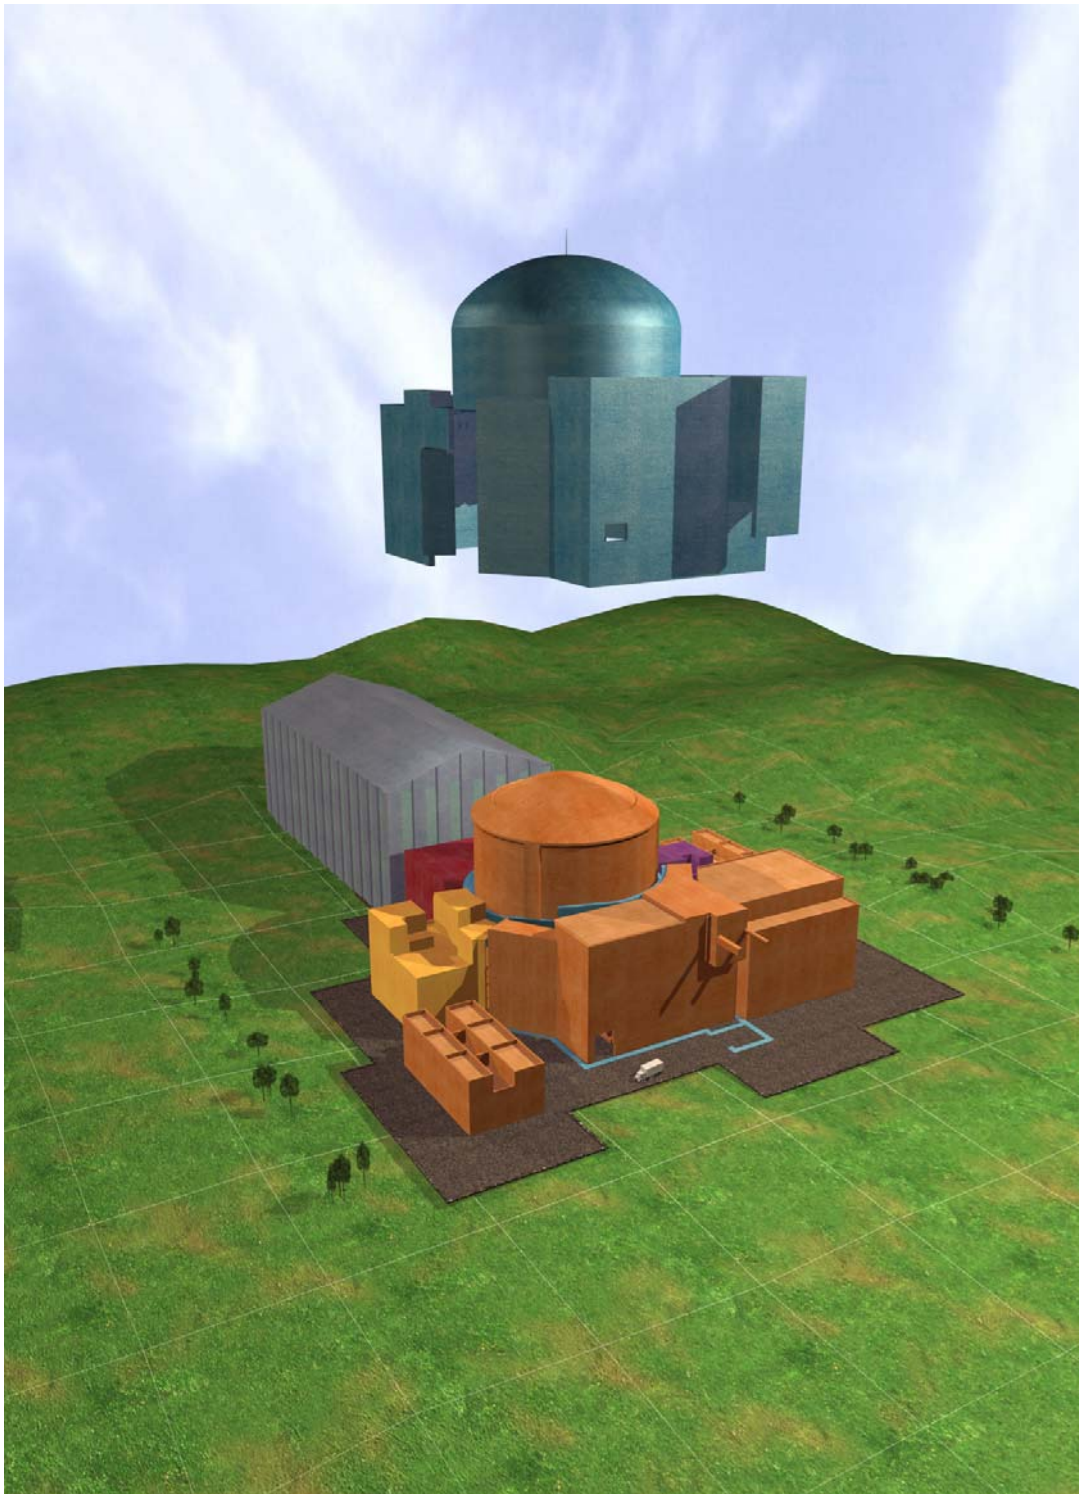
2: SHIELD BUILDING AND CONTAINMENT BUILDING INTERIOR STRUCTURES AND EQUIPMENTS
